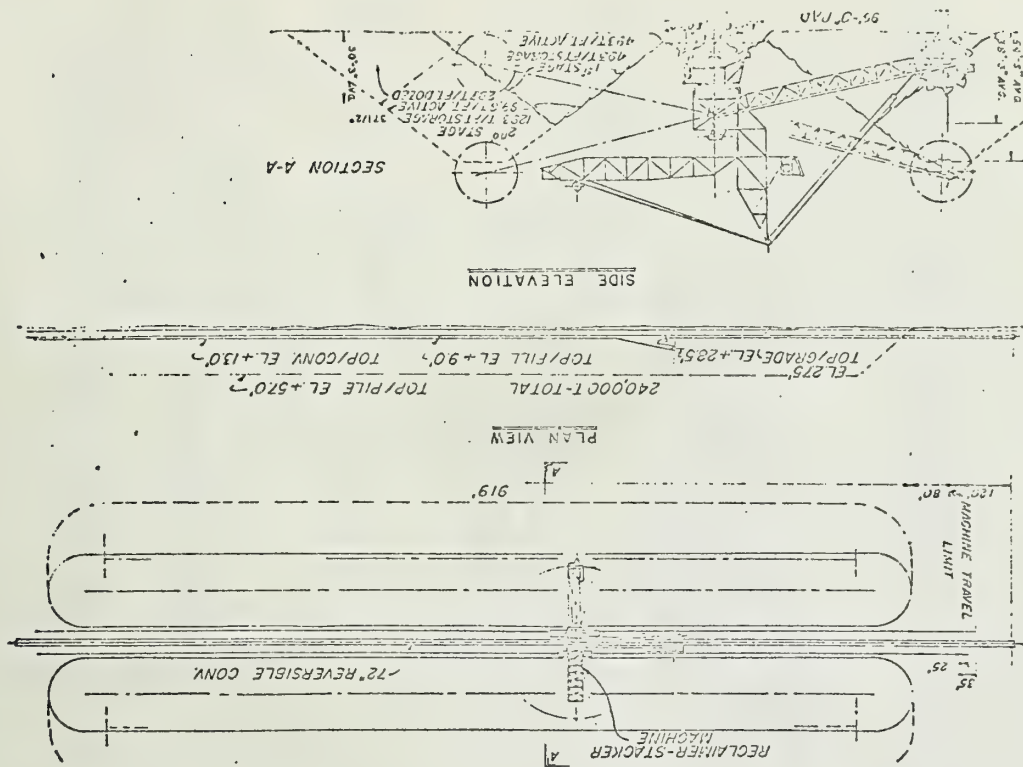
Twin windrow storage with wheel machine used for stocking and reclaiming.
